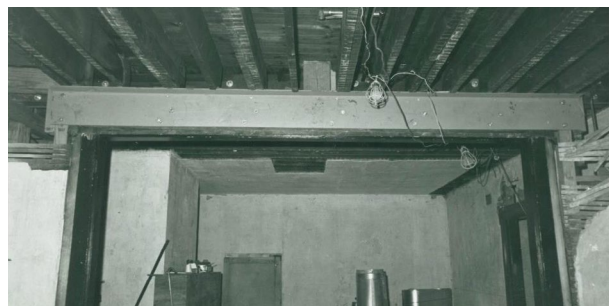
View of the galvanized steel beams and posts supporting floor joists under the first floor. This view is looking west, under the north side of the basement. Source: Lawson Elser
